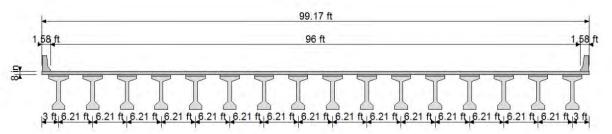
Perryville Rd. Bridge Half - Typical Section
